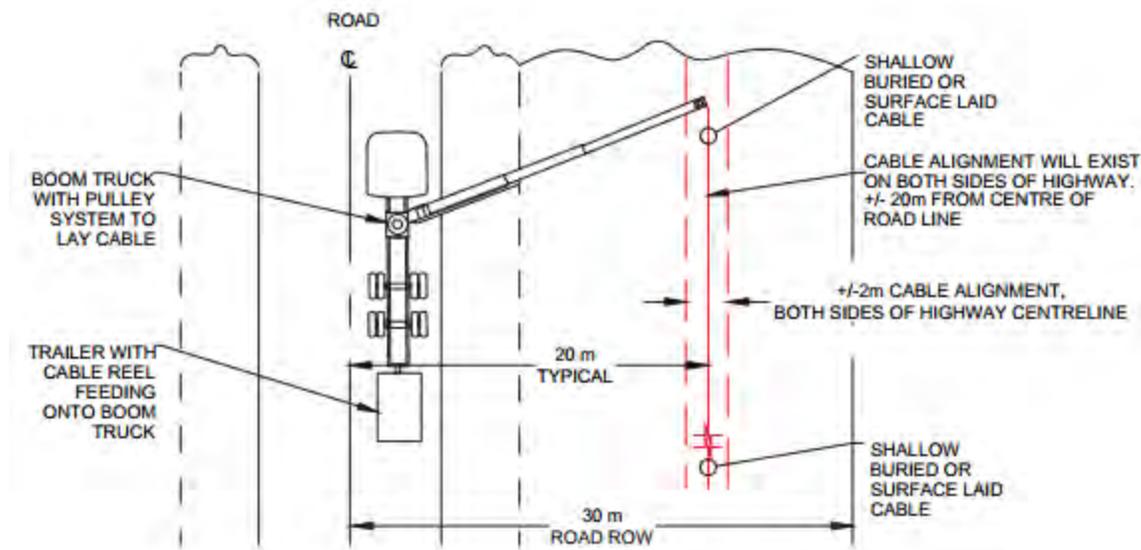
Typical Positioning of Boom Truck and Equipment Used for Surface Lay
